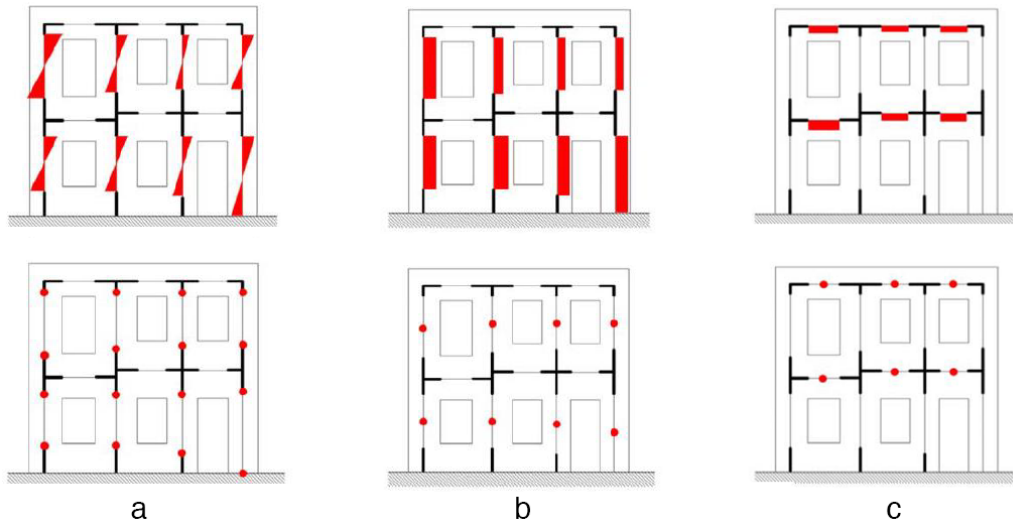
NL hinge location: a) Moment hinges on the piers; b) Shear hinges on the piers; c) Shear hinges on the spandrels (adapted from [6])
